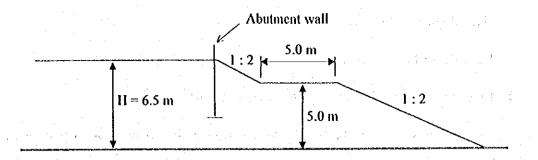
Fill in Longitudinal Direction before Construction of Abutment
